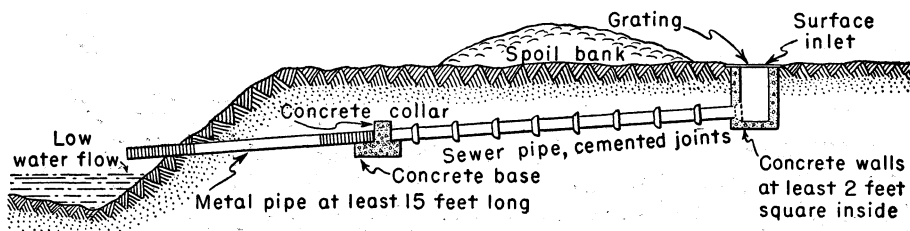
Pipe outlet under spoil bank to carry surface flow from low ground to drainage ditch. The water enters through a concrete inlet back of the spoil bank.
